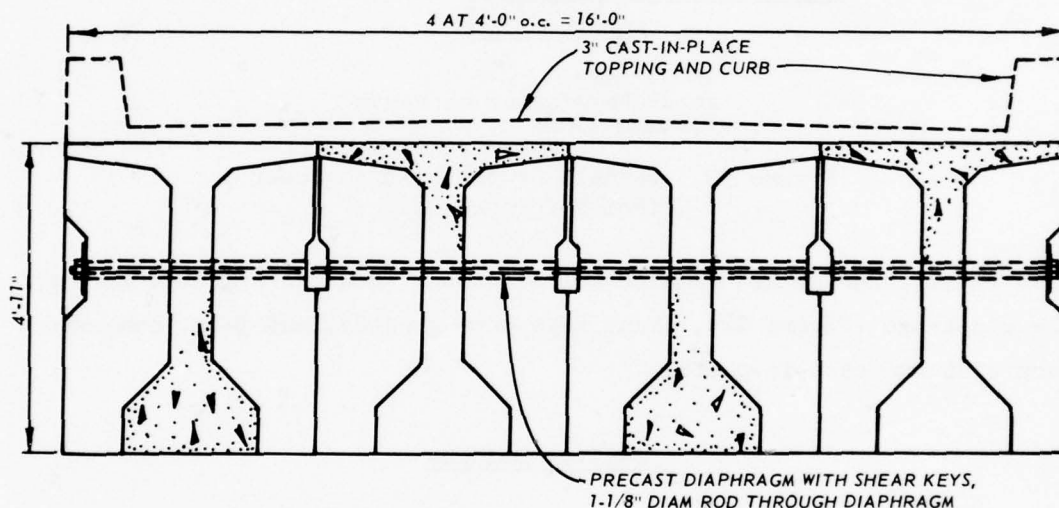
Cross section of the Klickitat River bridge girders (from Reference 28)
